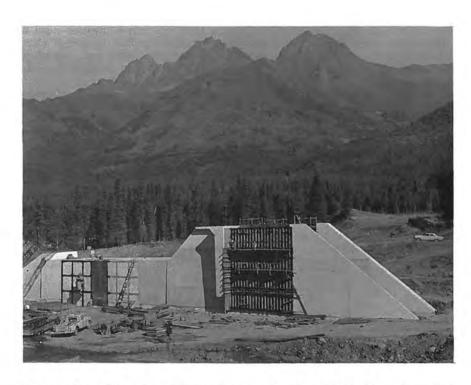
Concrete placements on the inlet and conduit sections of the spillway nearing completion. P783-908 C&R-172NA, August 19, 1965.
